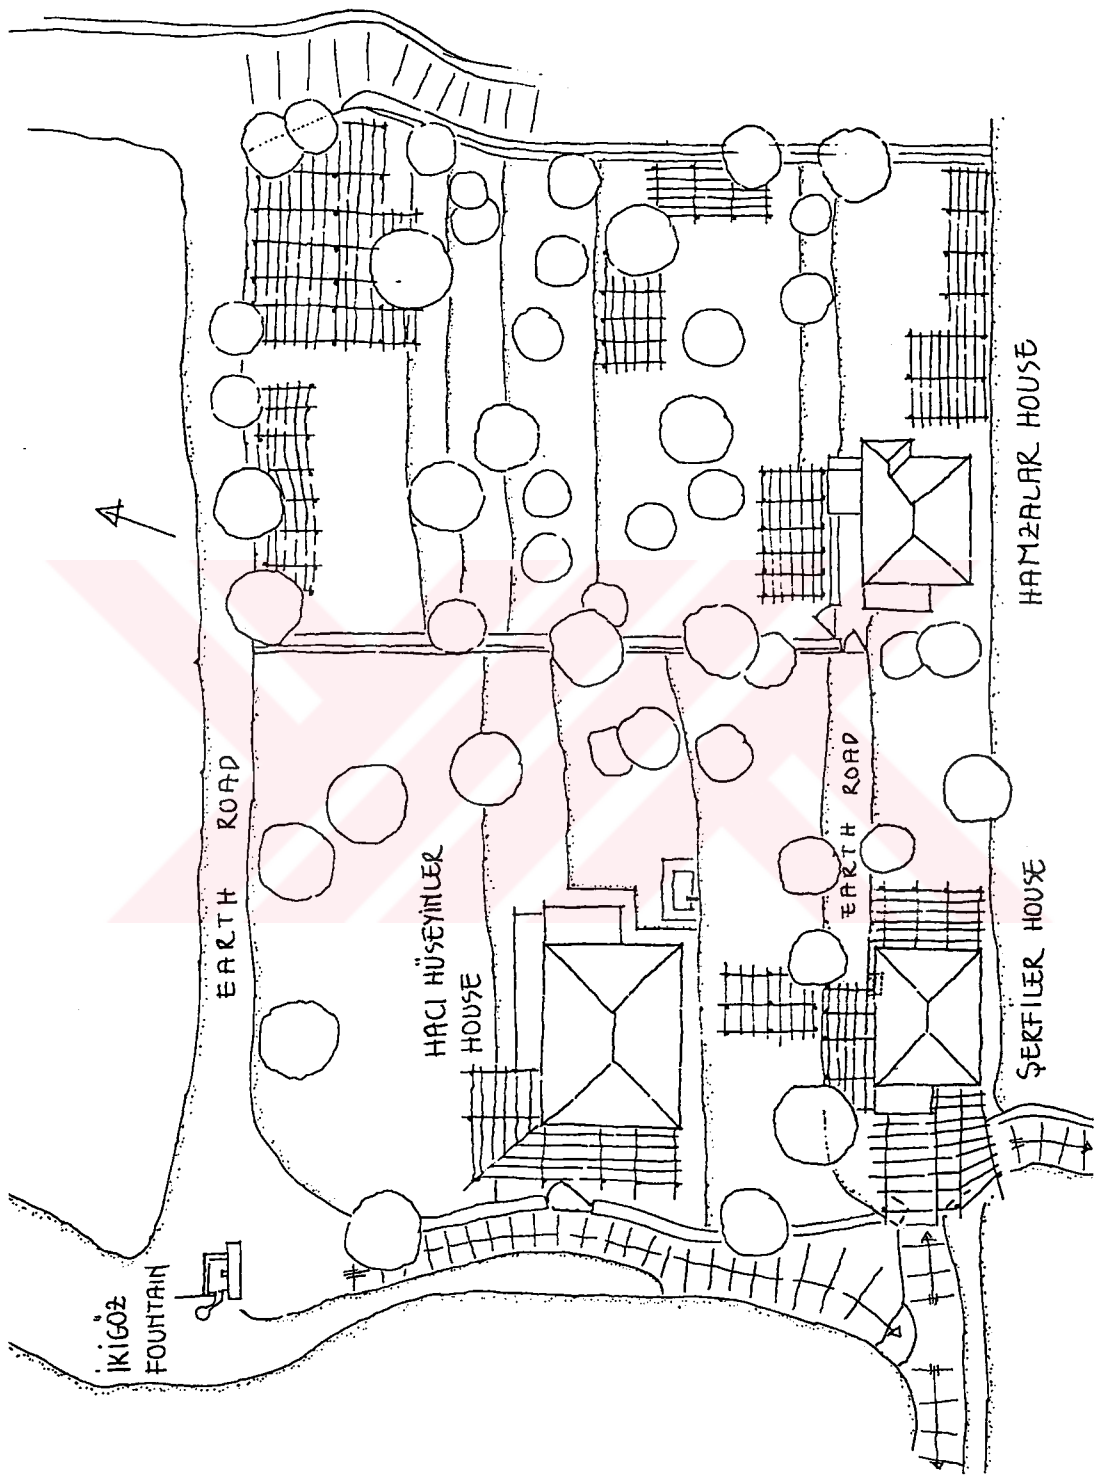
Schematic site plan of Şerfiler House - not to scale.
